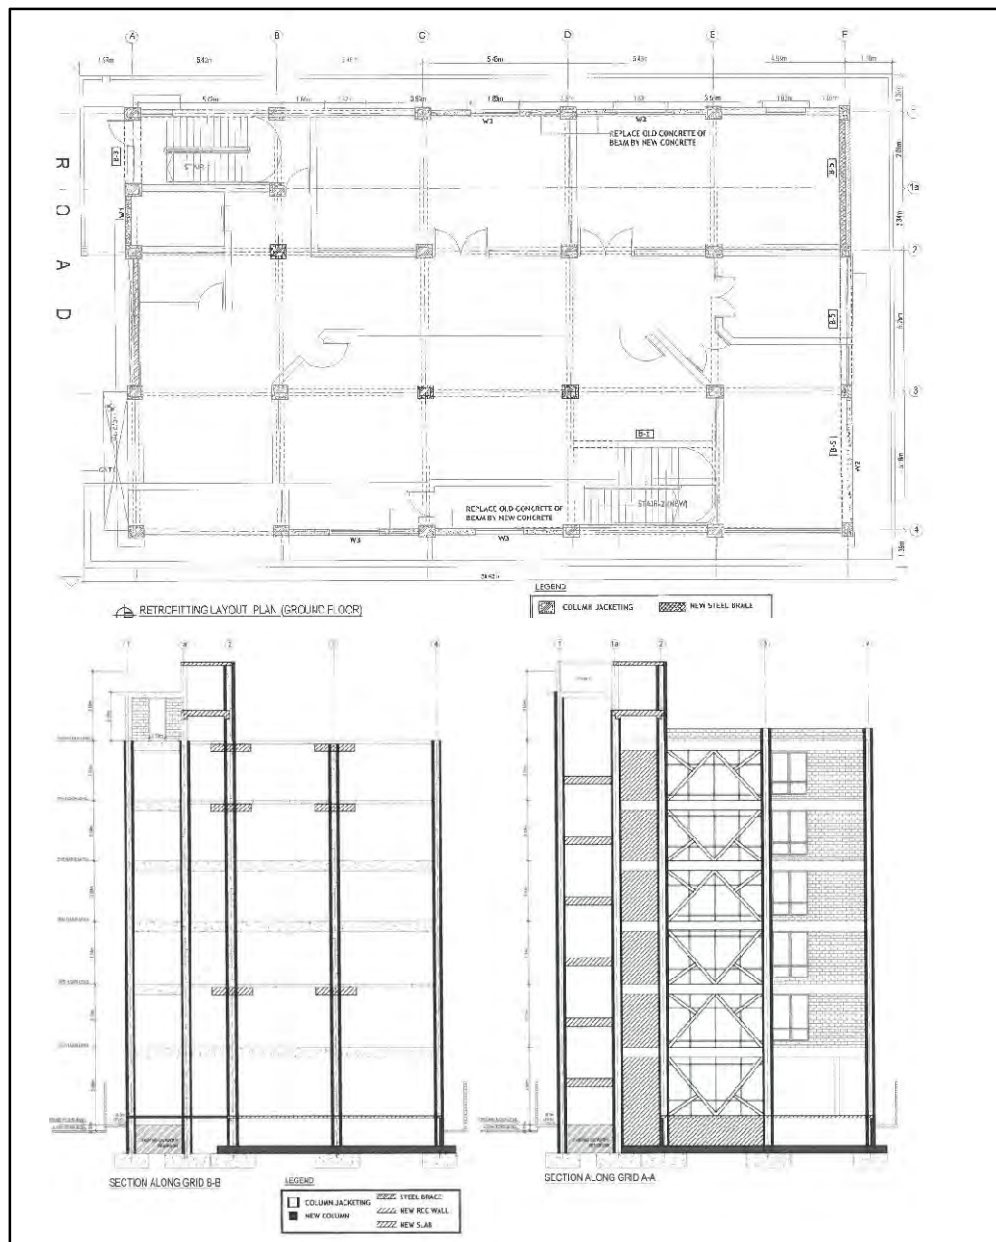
Framing plan and framing elevation of Factory No.2
